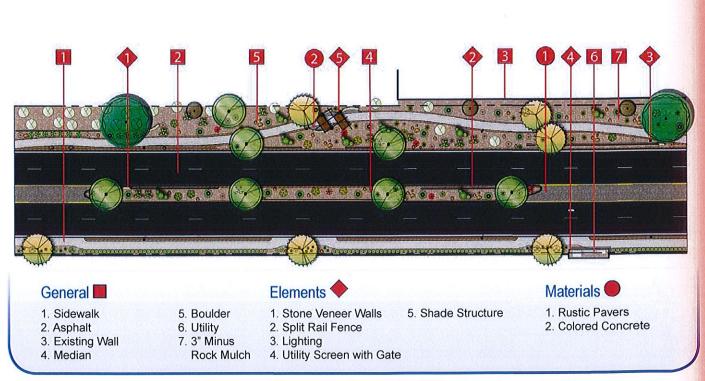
"Best" Rural Elegance Conceptual Streetscape Plan
